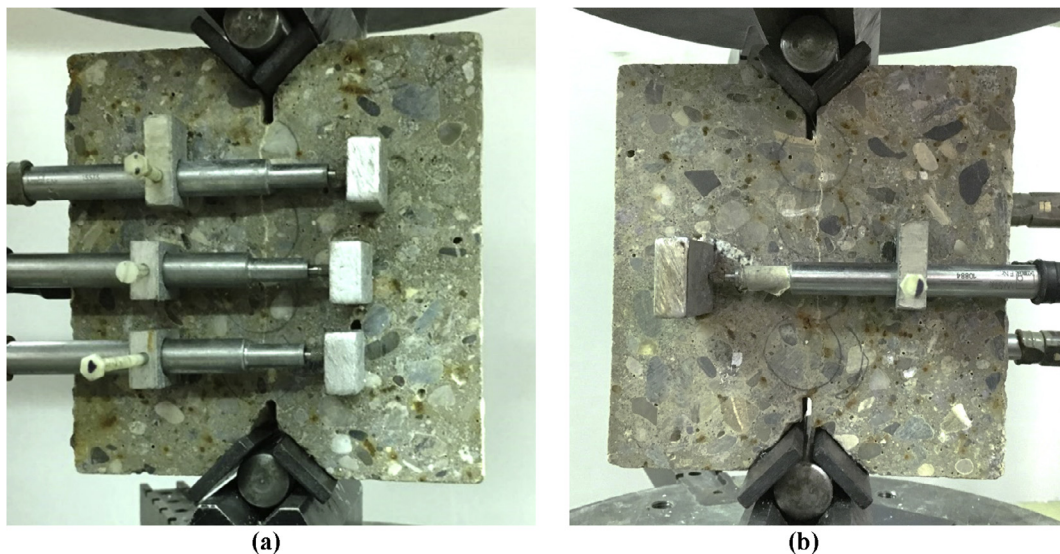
Test set-up of Double edge wedge splitting (DEWS) tests: front (a) and rear face (b).
